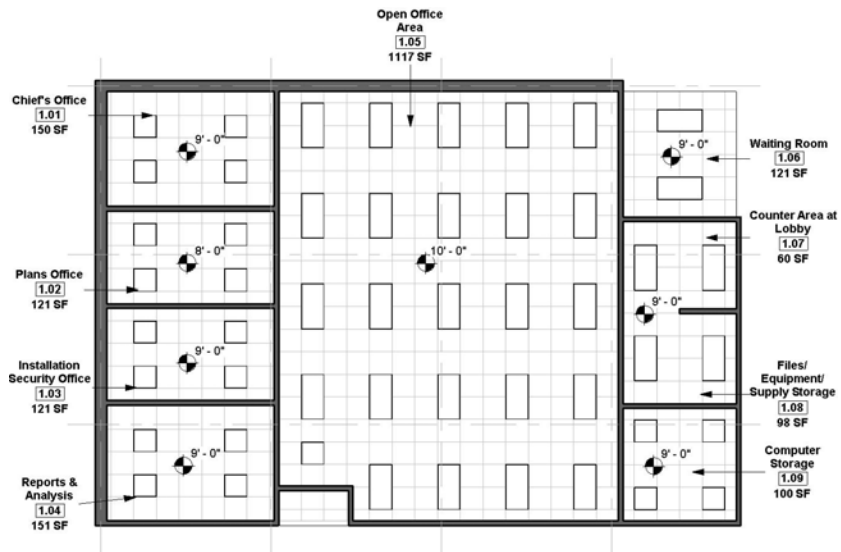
Module 1: Police Service & Installation Security/ S5 – Reflected Ceiling Plan
